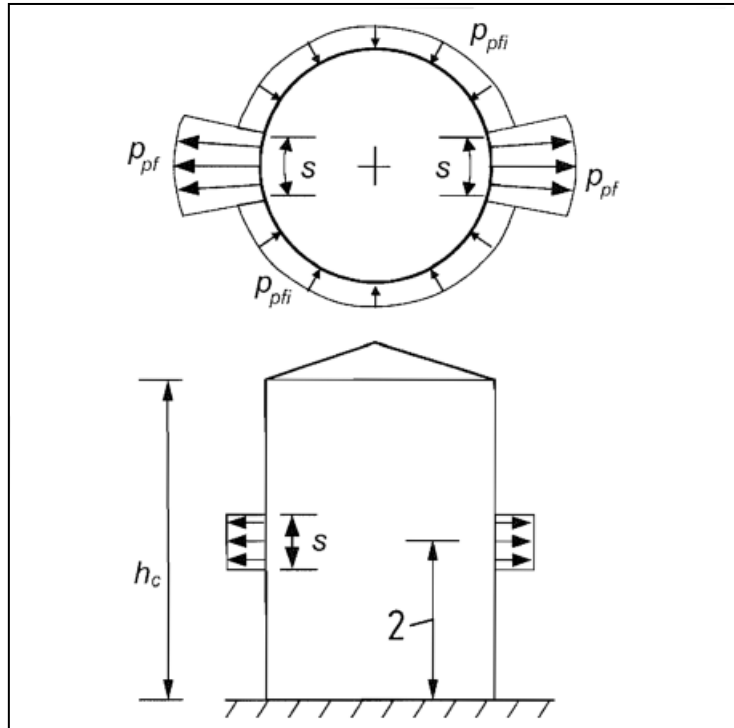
Circular silos: side elevation and plan view of the filling patch load.
